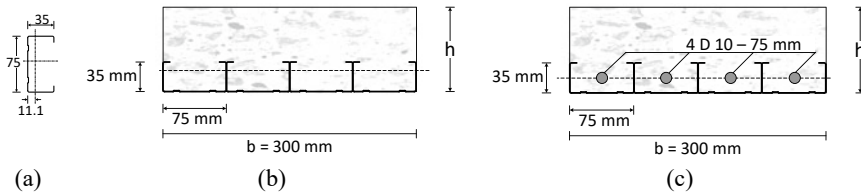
Specimen: a light gauge steel section, b composite section, and c hybrid section
